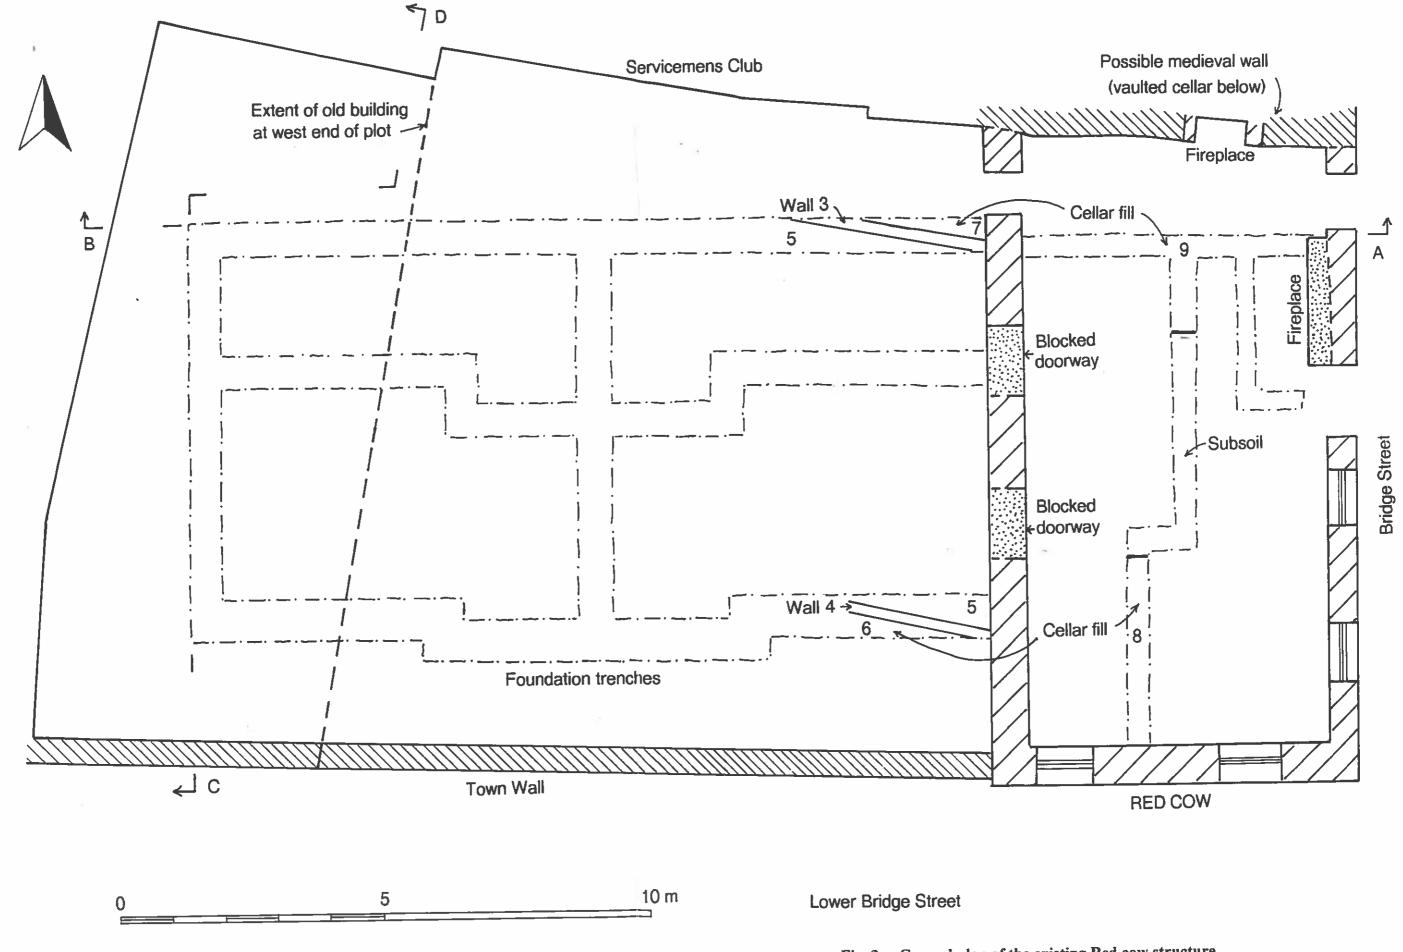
Ground plan of the existing Red cow structure showing layout of new foundation trenches and location of elevations and profiles
